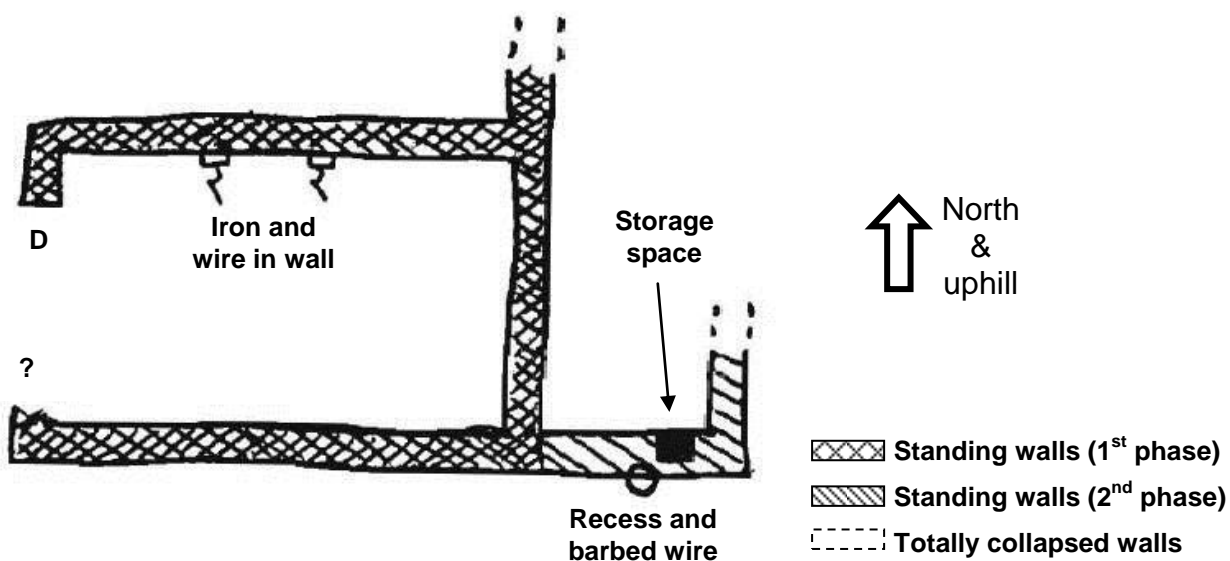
Schematic floor plan of the outbuilding at KV2013/002 (point 012). The door (D) is indicated. Drawing not to scale.
